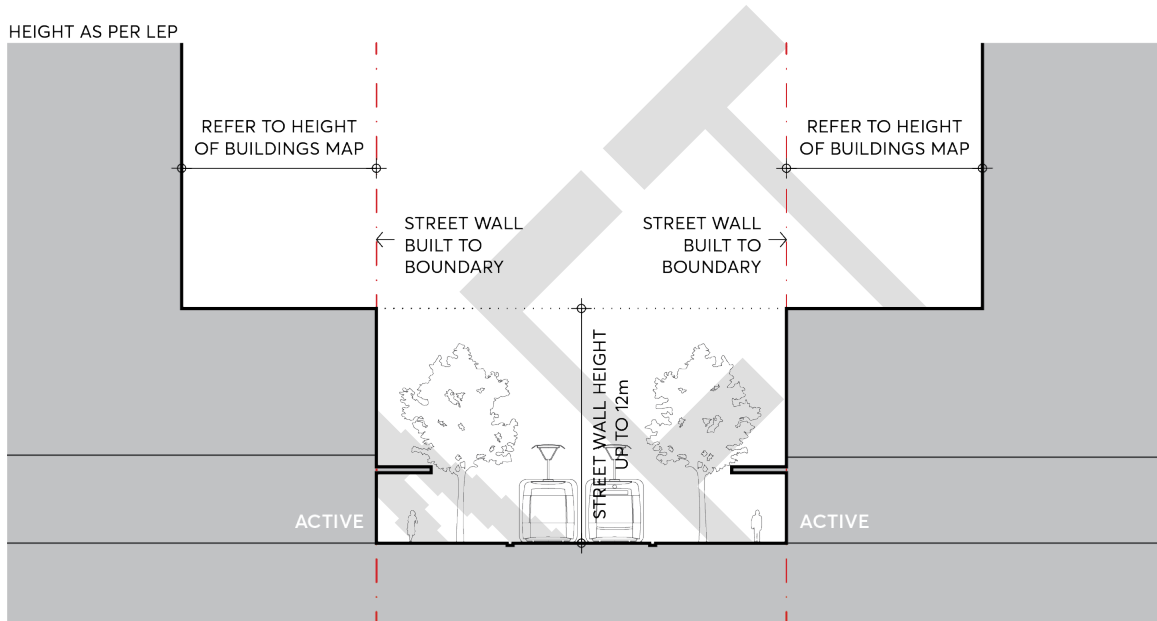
Church Street - Street Setbacks and Street Wall Height
